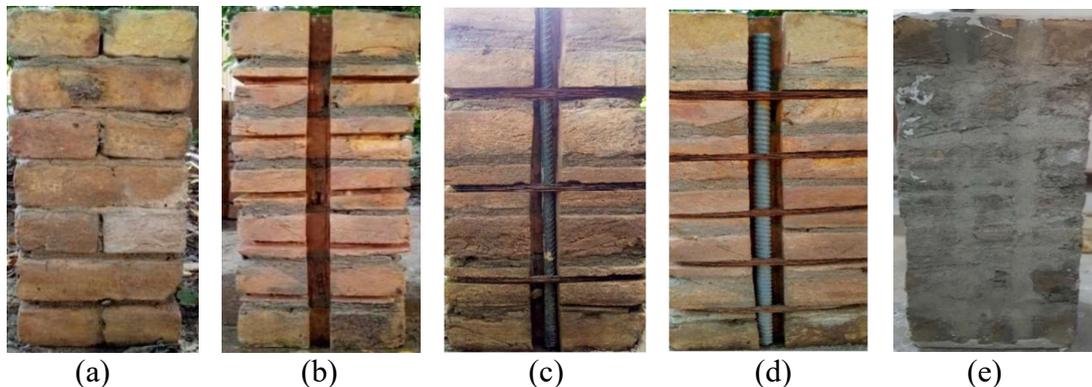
Specimens preparation (a) stage 1 (casting) (b) Stage 2 (grooving) (c & d) stage 3 (specimen retrofitting) (e) stage 4 (groove backfilling)
